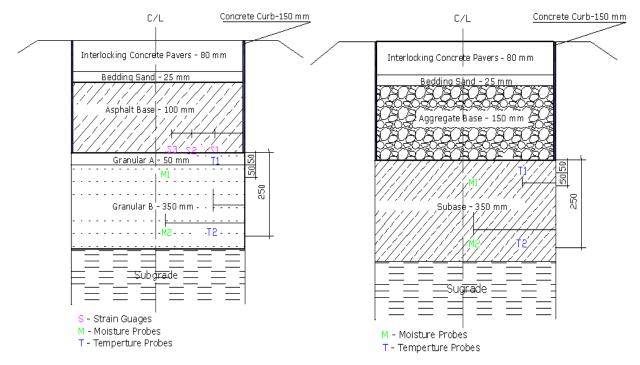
Profile View of Instrumented Crosswalk Three and Four at UW Ring Road
